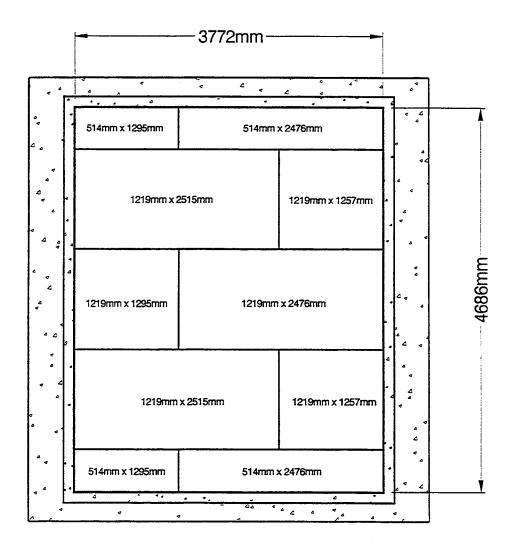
Single layer or base layer of gypsum board layout, resilient metal channels 610 mm o.c.
